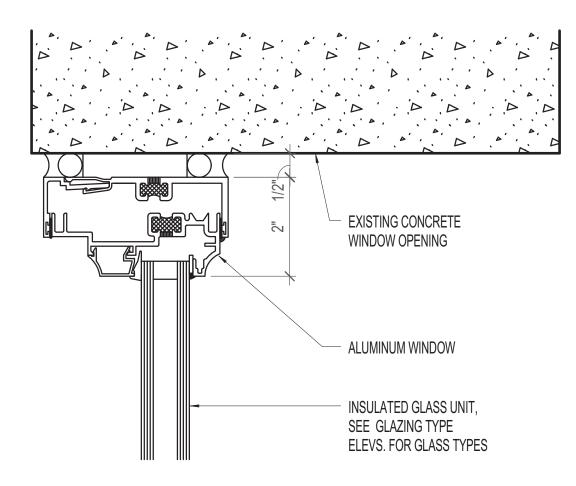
DETAIL: TYPICAL ALUMINUM REPLACEMENT WINDOW
